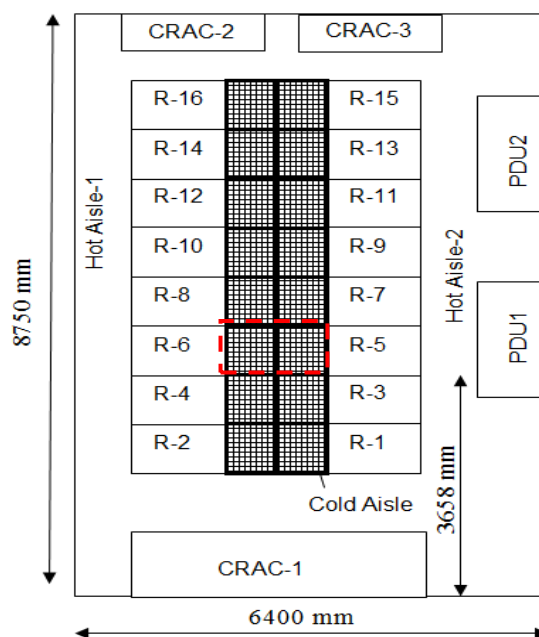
Test cell plan view (Tile: 610 mm x 610 mm with 56% porosity, Rack Height: 2,100 mm , 2,712 mm drop ceiling height: 2712 mm, under-floor plenum: 914 mm, and drop ceiling plenum: 1524 mm). The
